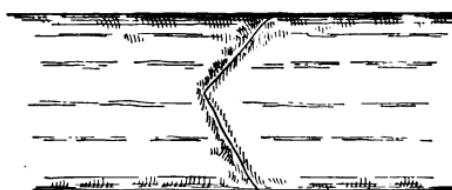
A PROPERLY CONSTRUCTED BAR.
